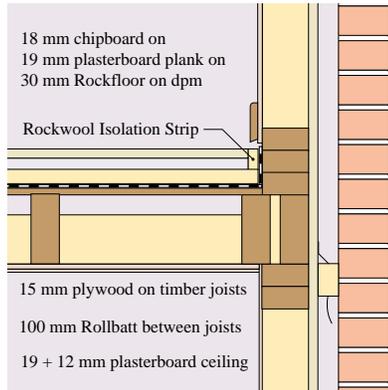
Timber joisted floor using Rockwool Rockfloor and Rockwool Rollbatt
